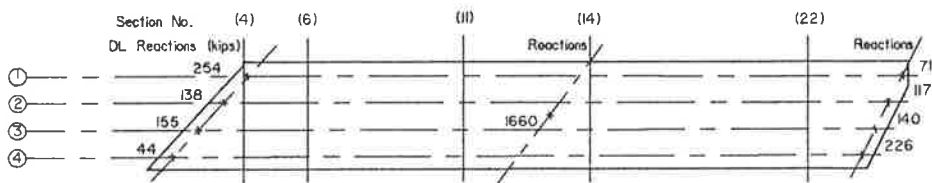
Sectional Framing Plan - Half of SPRR Bridge
